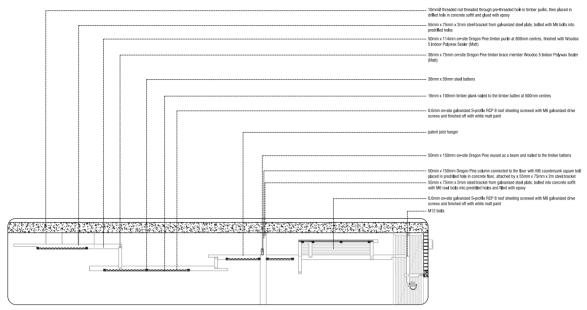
The ceiling detail made of reused timber and corrugated roof sheeting. (Author: October 2013)
